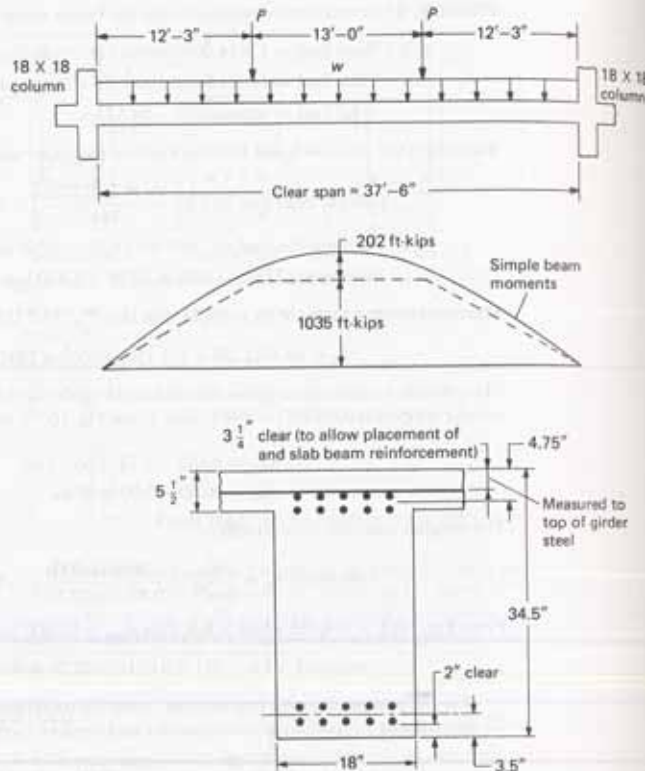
Loading information for floor girders 2G1 and 2G2.
